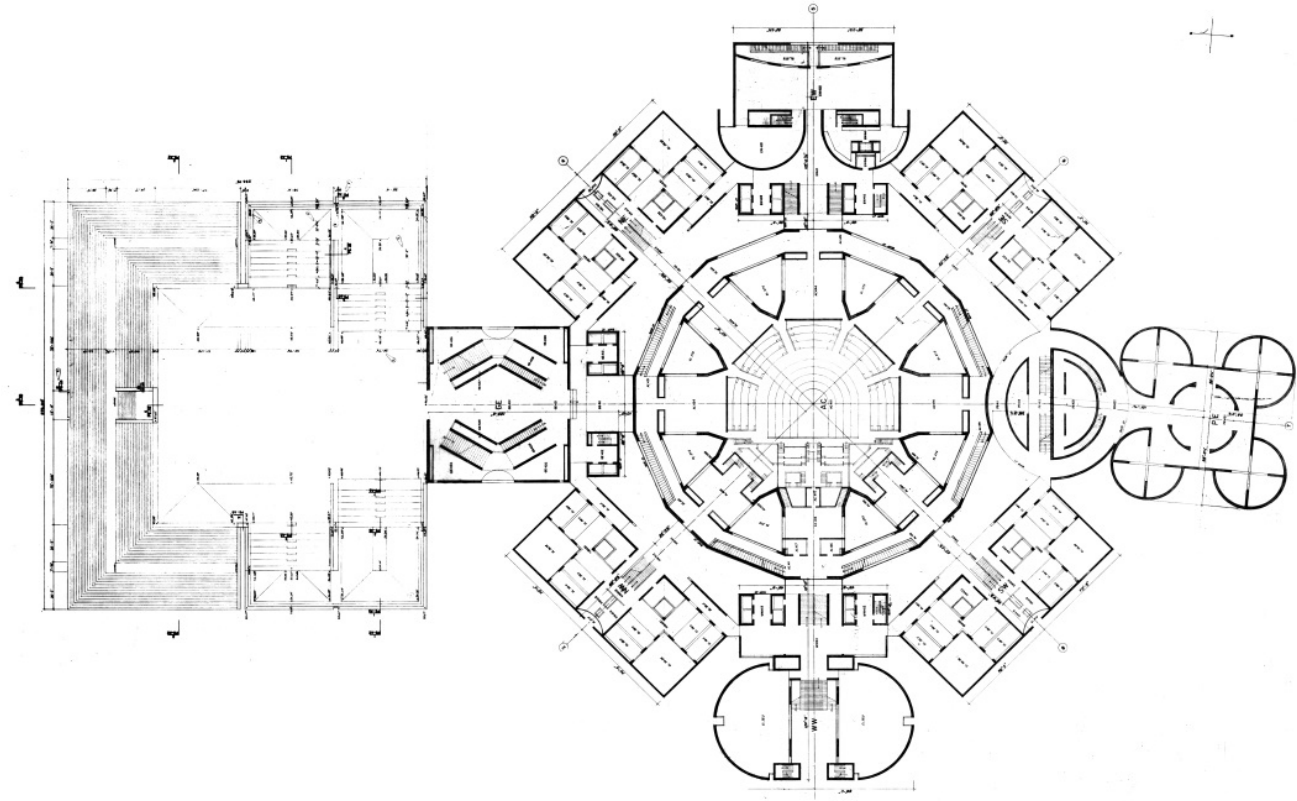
National Assembly Building Ground Floor Plan, Source: The Architectural Review
